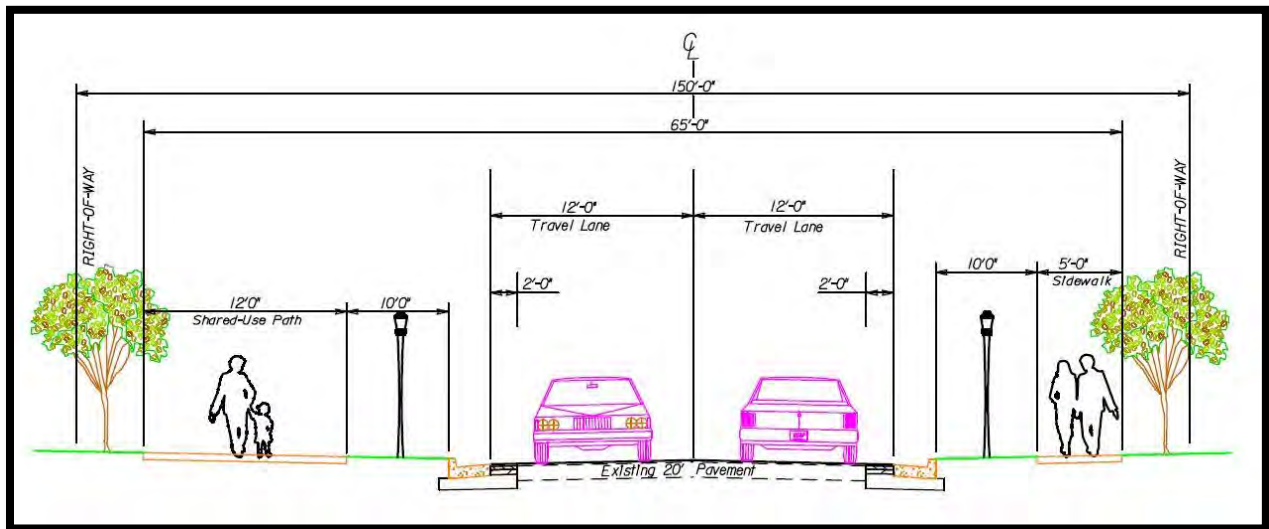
Proposed Typical Section – Alternative 1 – Georgia Ave.
